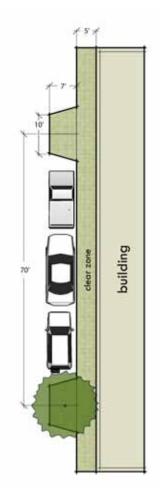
On-street parking on TOD Local Street without street tree/furniture zone.
